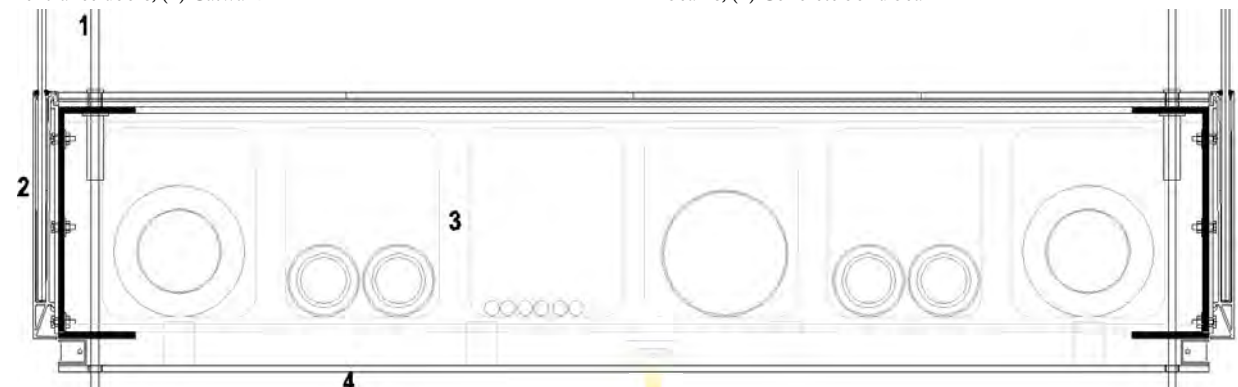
Catwalk solution. (1) Tension rod; (2) "Easy fix" glass handrail system; (3) Steel beams with openings; (4) Suspended ceiling
